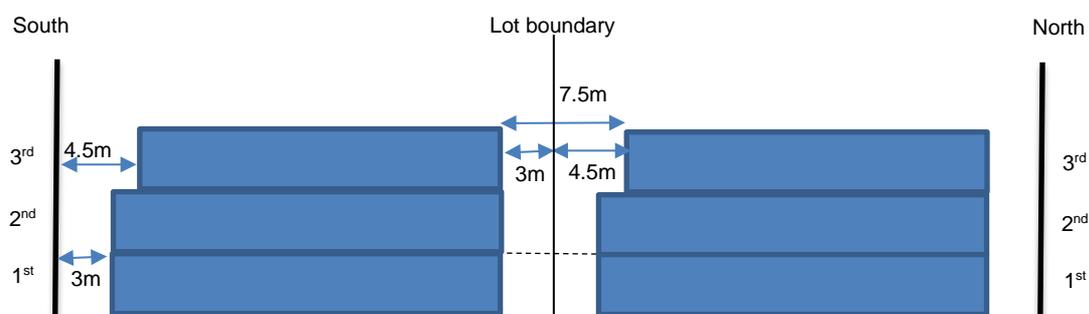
Example of R60 side building setback. Front view showing side setback (where building length is less than 16m).
